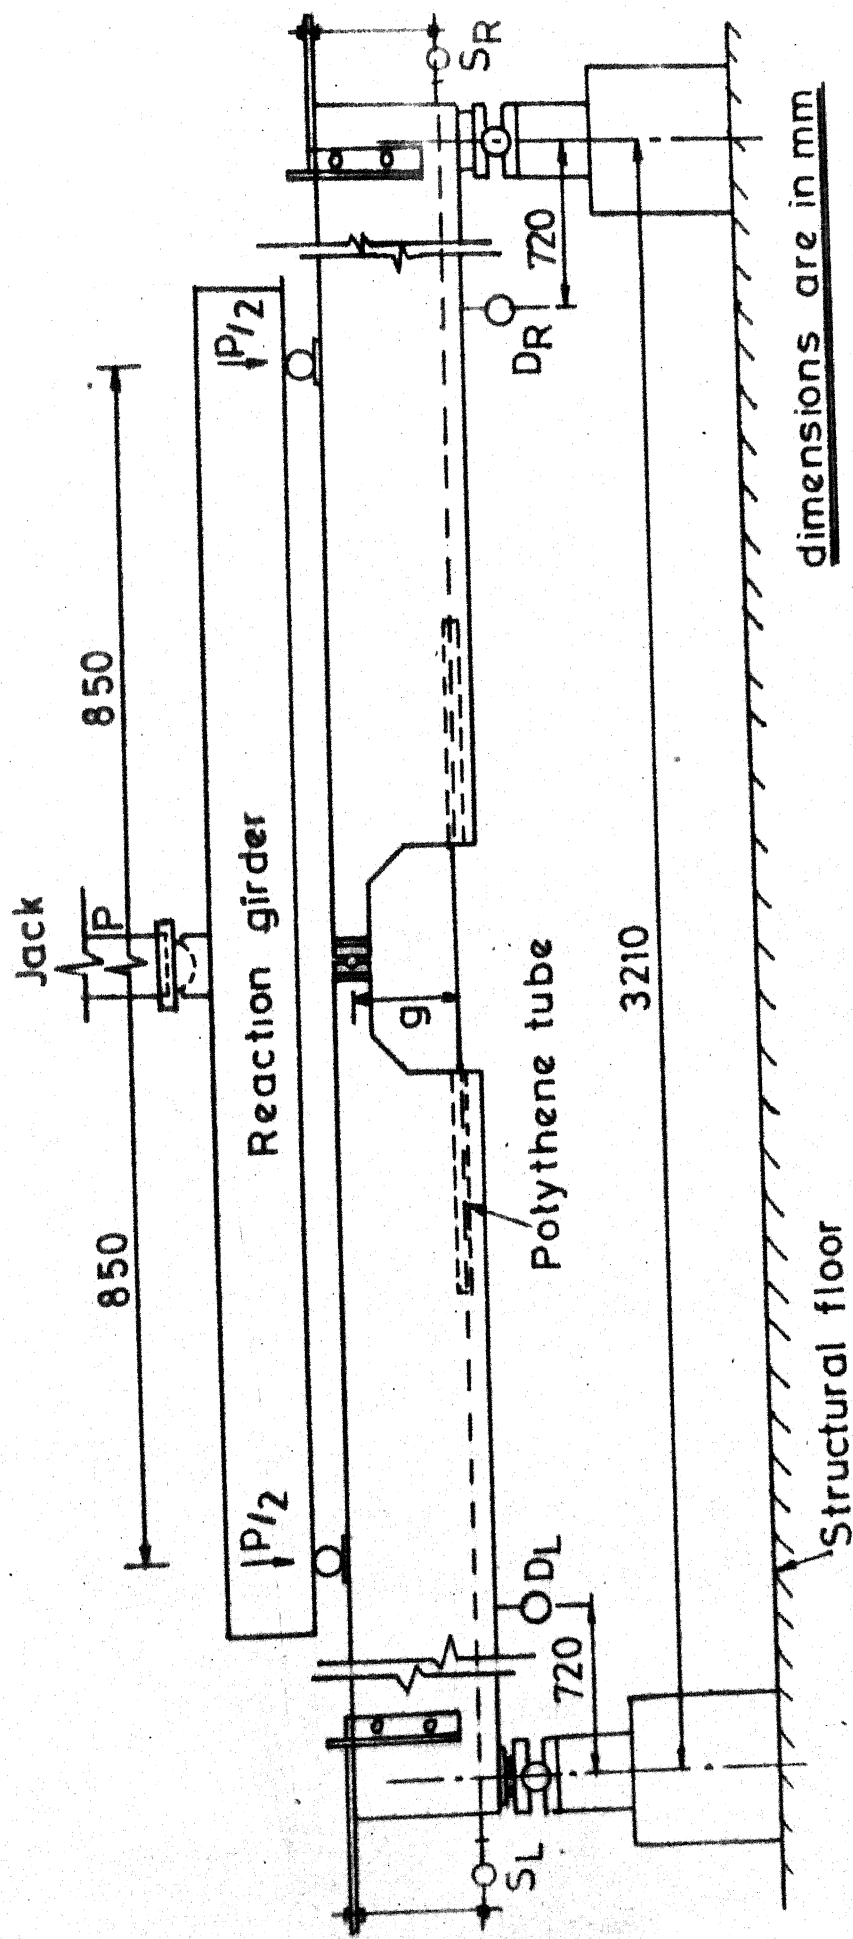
DETAILS OF BEAM TEST SPECIMEN AND TEST SET-UP
